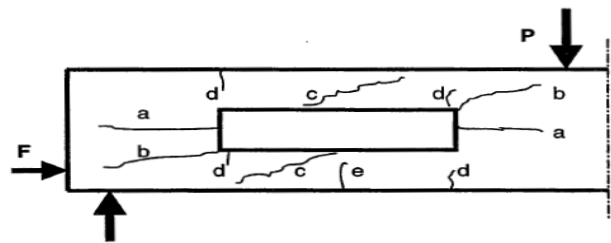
Crack patterns in prestressed reinforced concrete beams containing openings.
